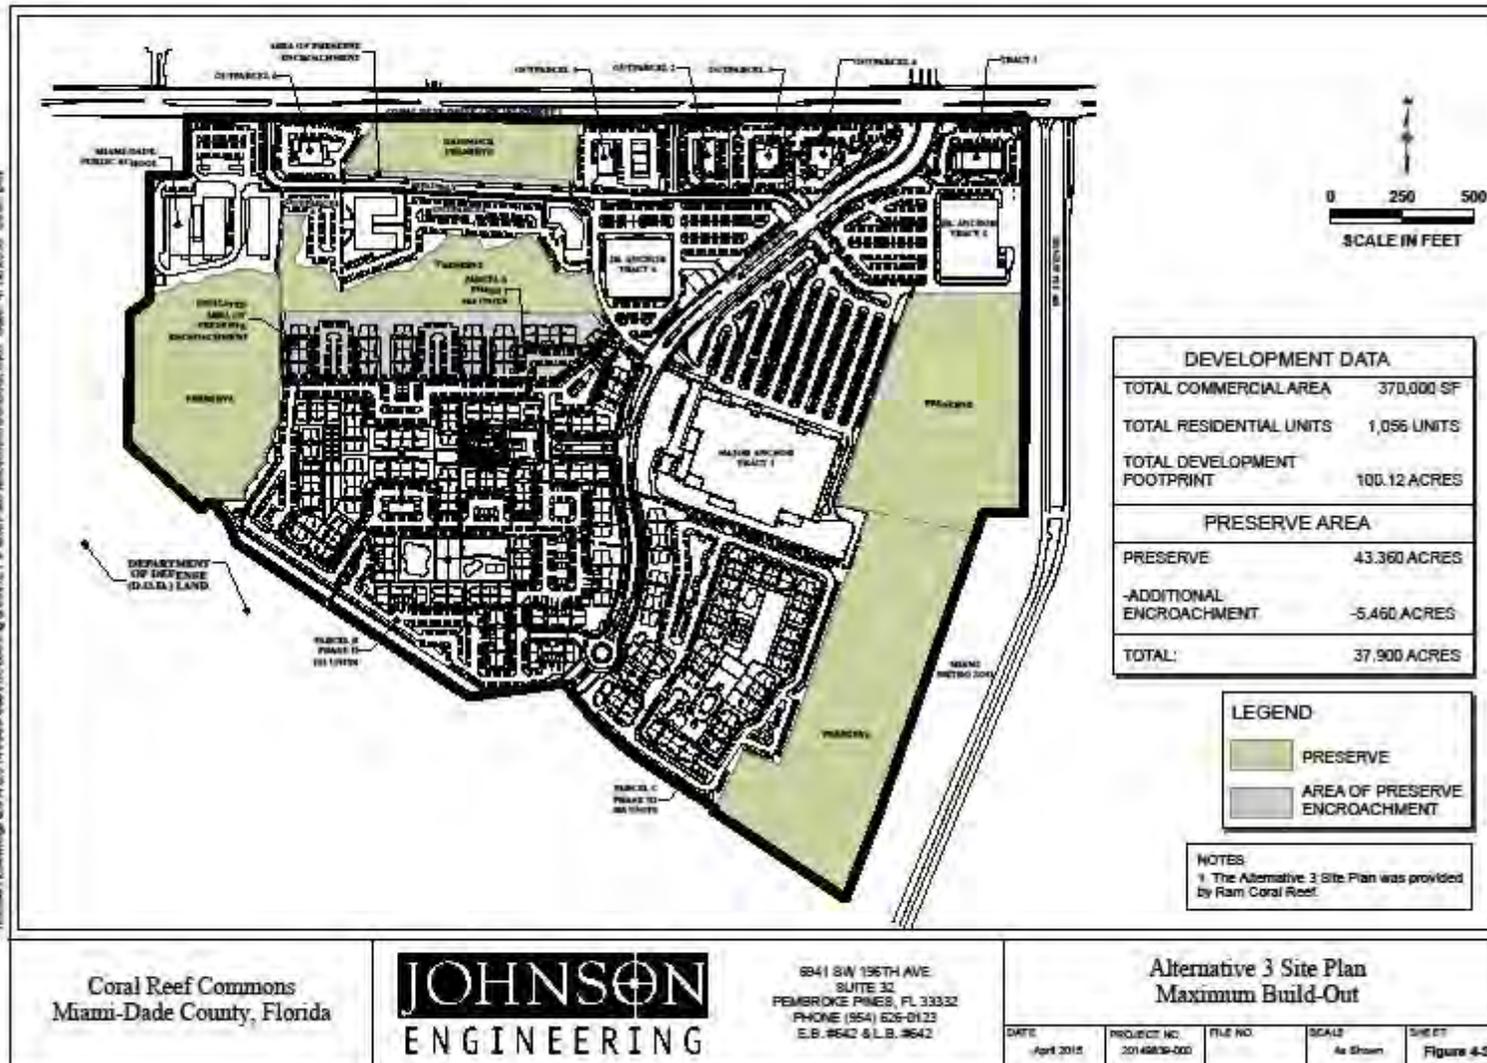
Alternative 3 Site Plan “Maximum Build-out”
